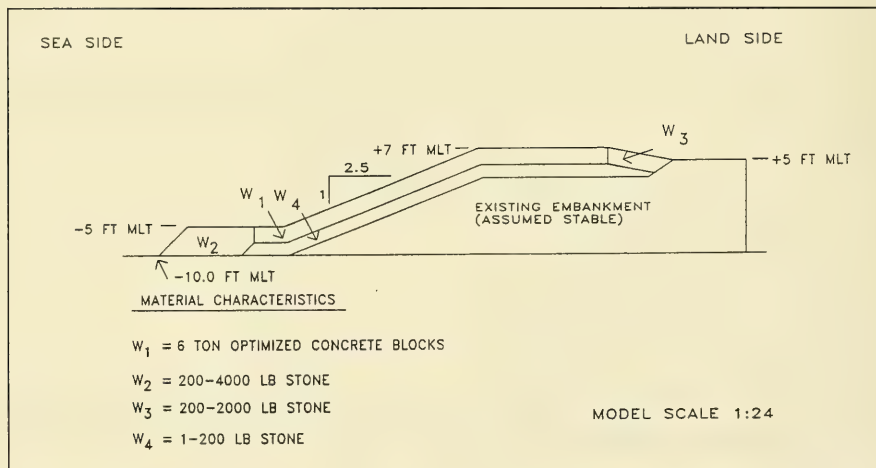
Optimized concrete block revetment cross section, Plans 8 and 8R
